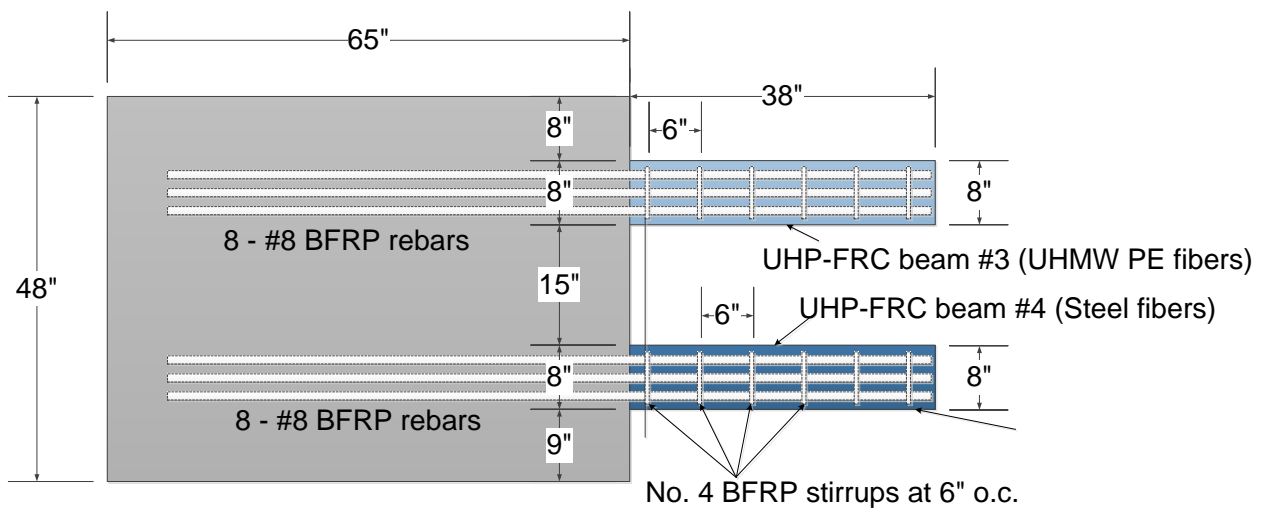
5 Detailed side view of the specimen showing specimens UHP-FRC #3 and #4
